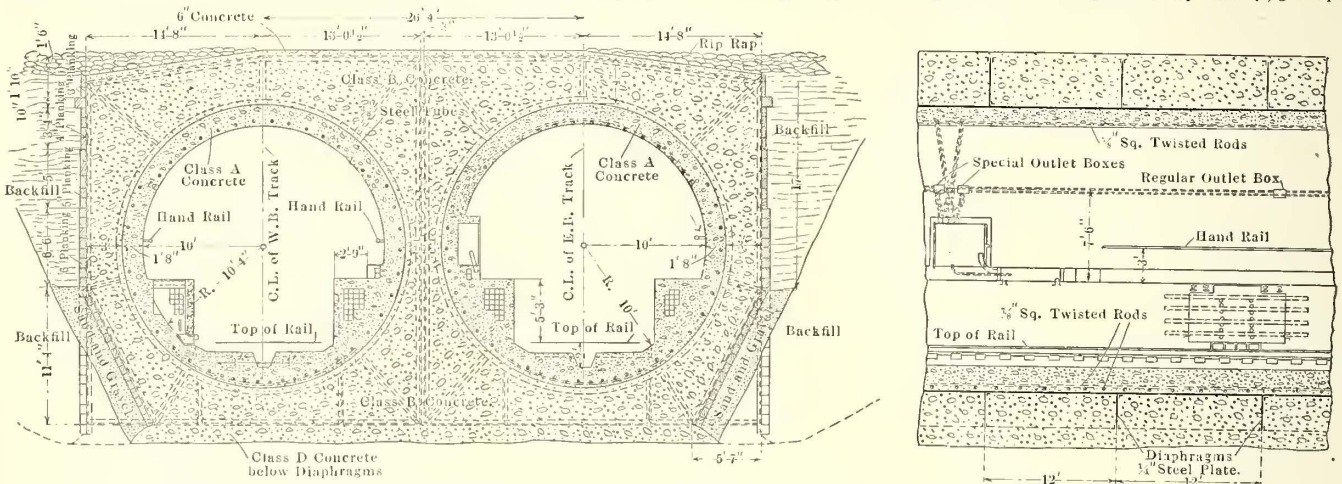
Detroit Tunnel—Cross-Section of Tunnel and Longitudinal Section of East-Bound Track
